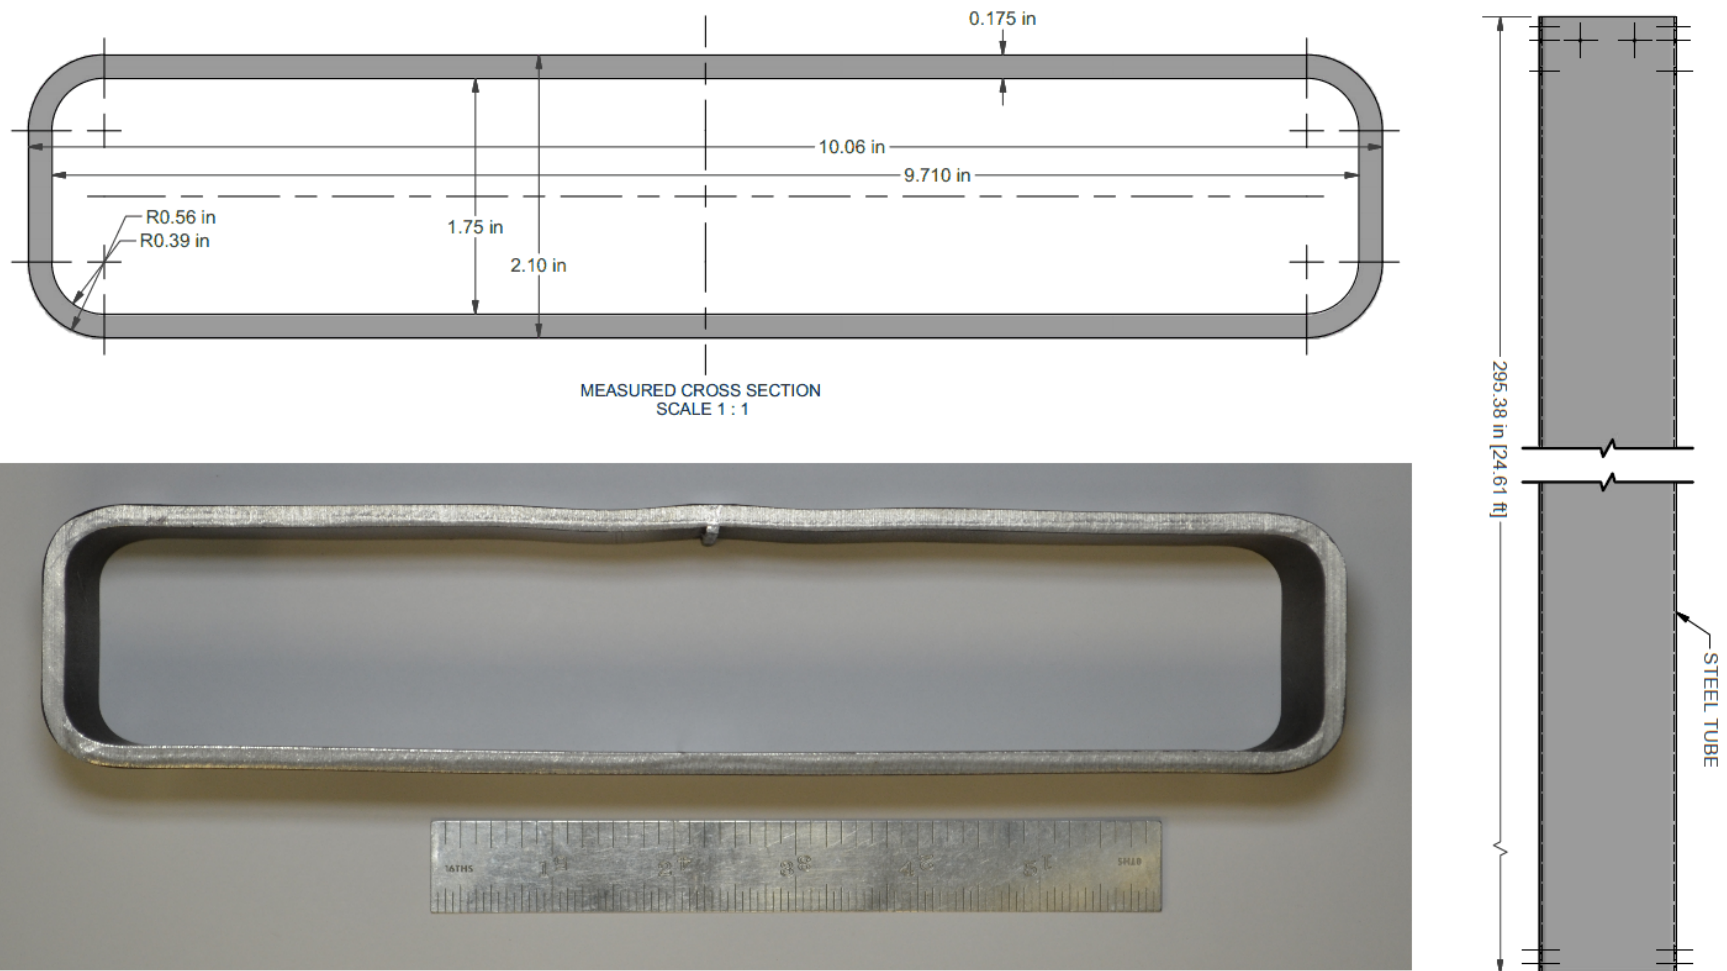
Cross section of riser ducts (dimensional drawing above, picture below)
